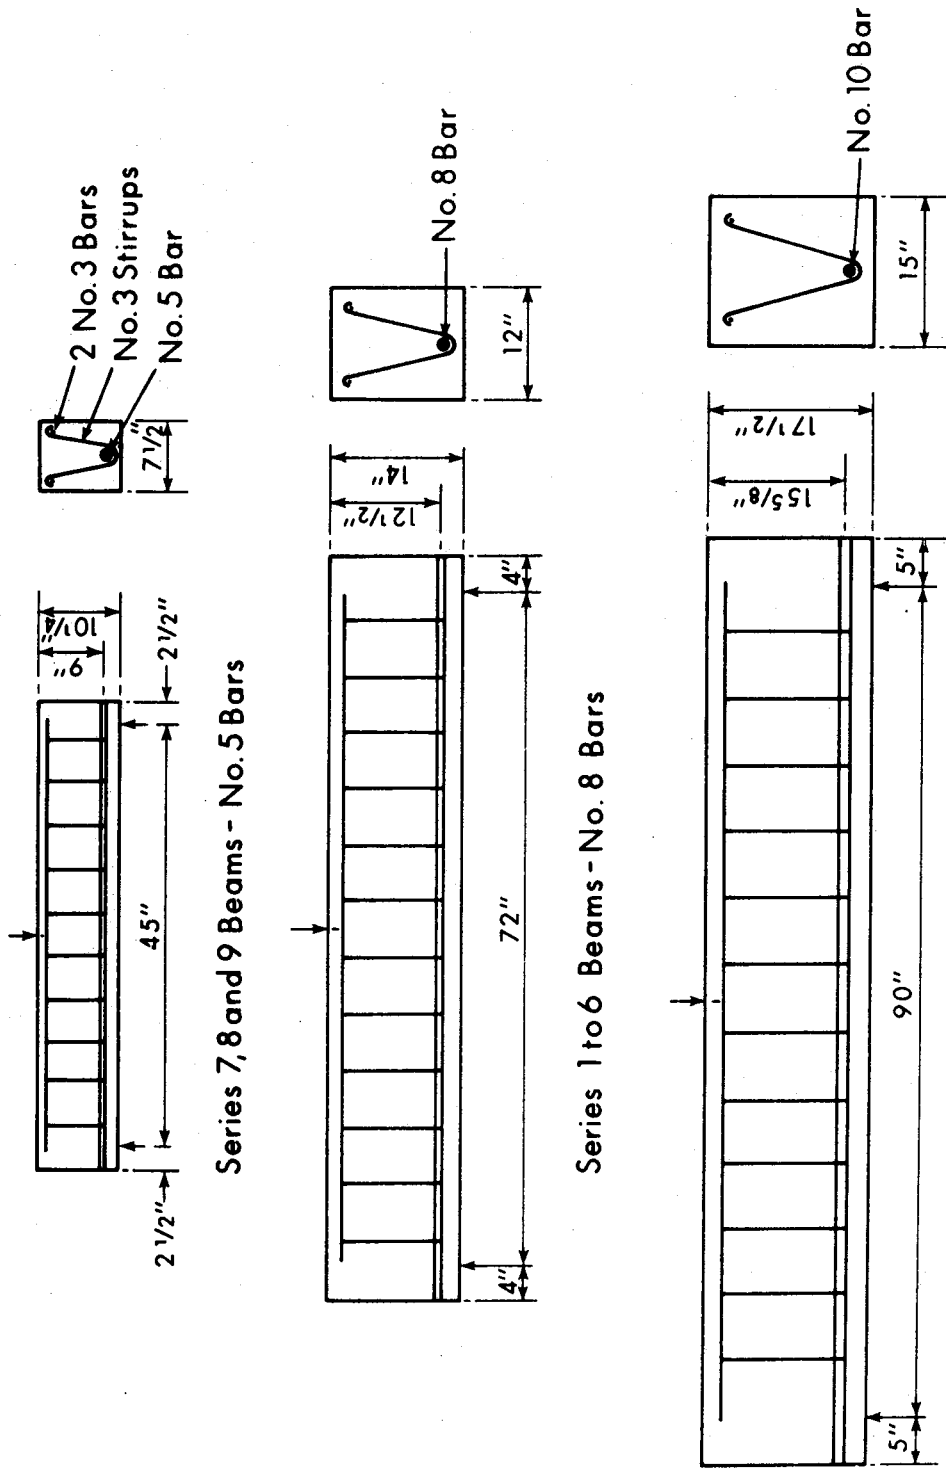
DETAILS OF BEAM SPECIMENS
